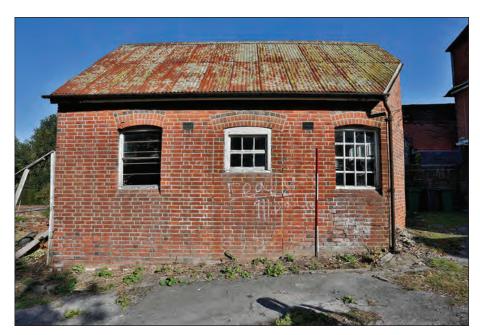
Rear workshop: south wall showing blocked central doorway (2019)
